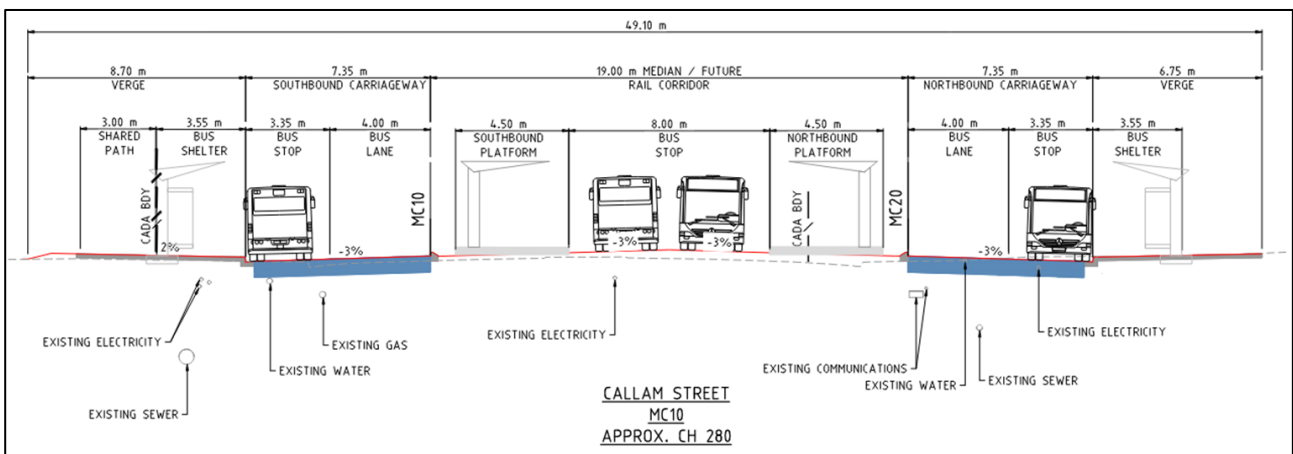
Callam Street Interchange Cross Section without Light Rail
